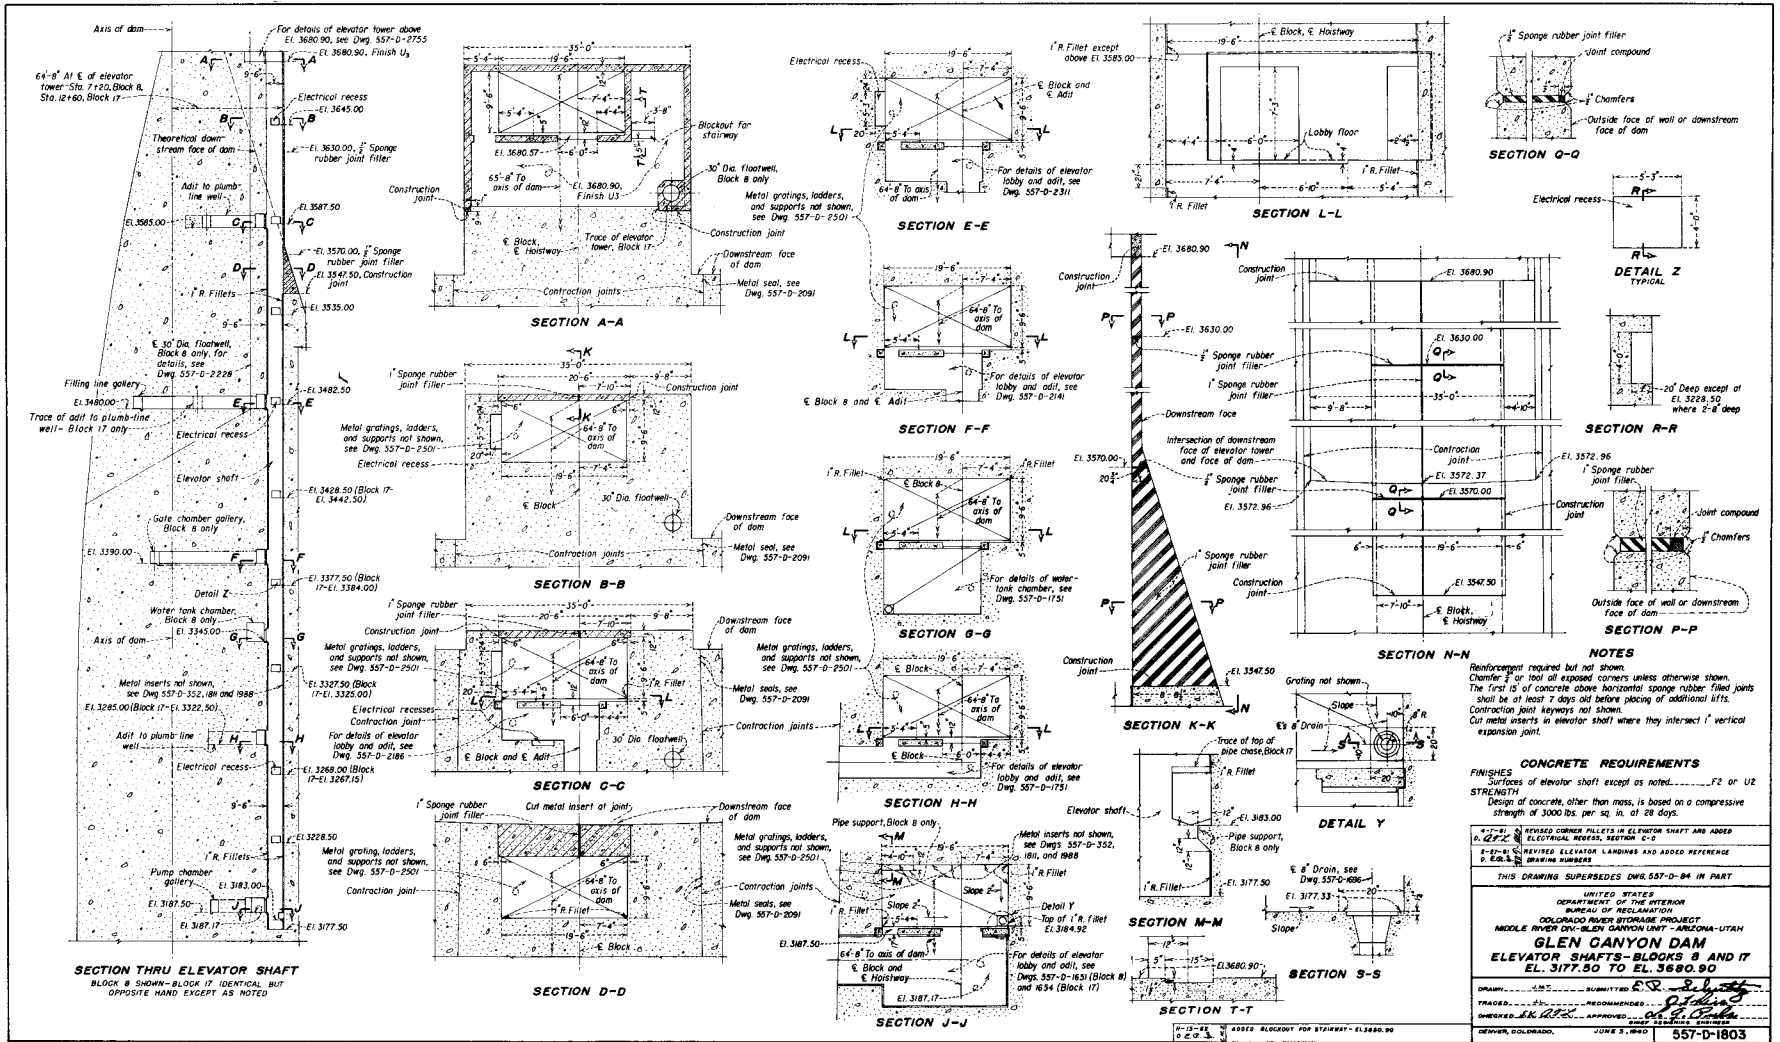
Dam elevator shafts, blocks 8 and 17—Elevation 3177.50 to elevation 3680.90.
